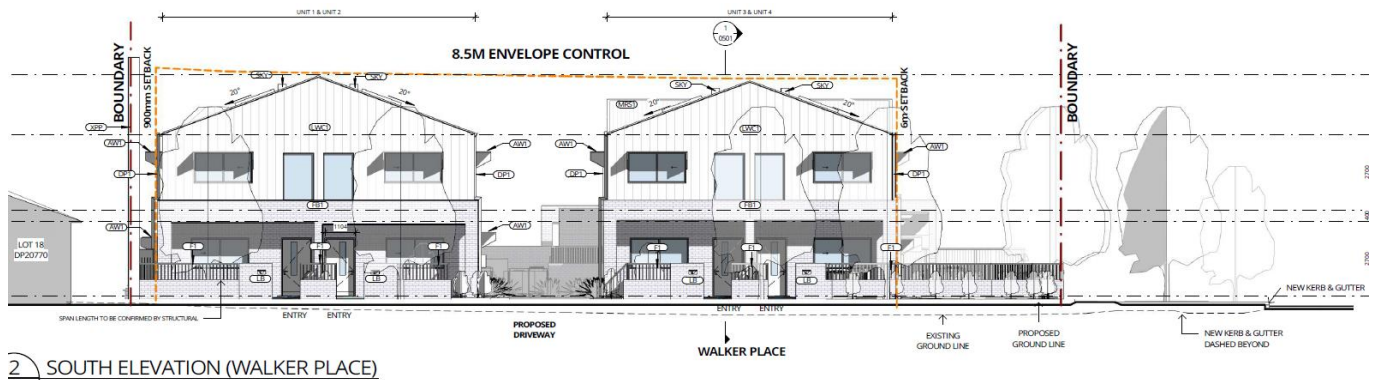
Extract from Architectural Plans – Walker Place southern elevation (Source: Appendix A Architectural Plans prepared by Webber dated 20/11/2023)
